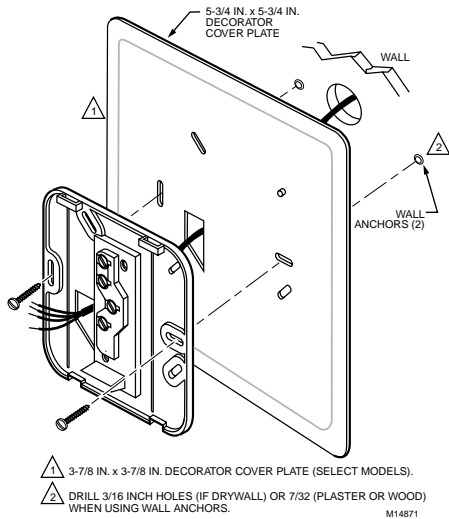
Mounting decorator cover plate and wallplate to the wall.
